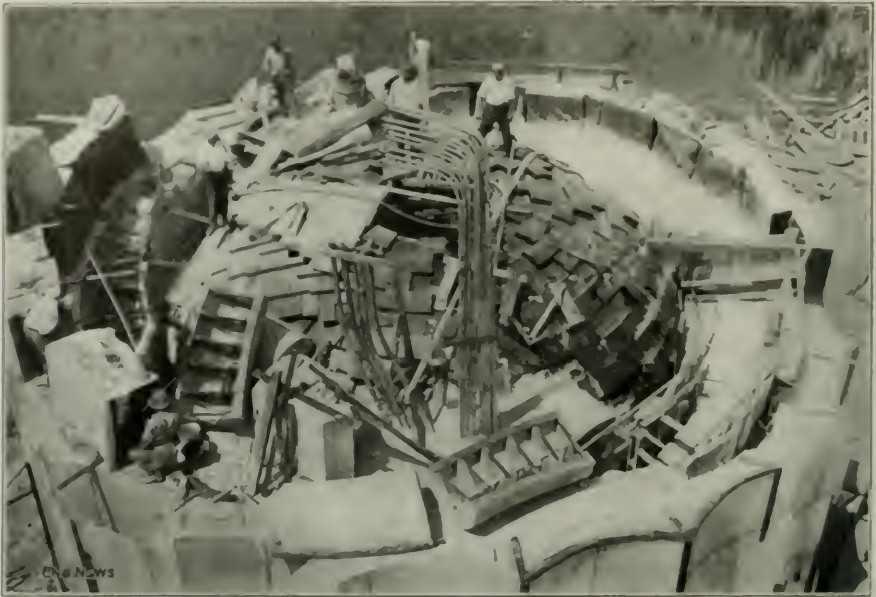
ELLIPTICAL VAULTED DOME OF ROTUNDA IN LOWER STORY OF TOWER. VIEW OF STONE VAULTING BEFORE CONCRETING
